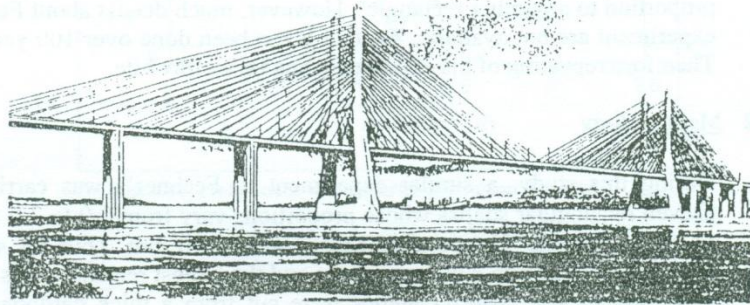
Twin-towered Vasco da Gama bridges.⁸
